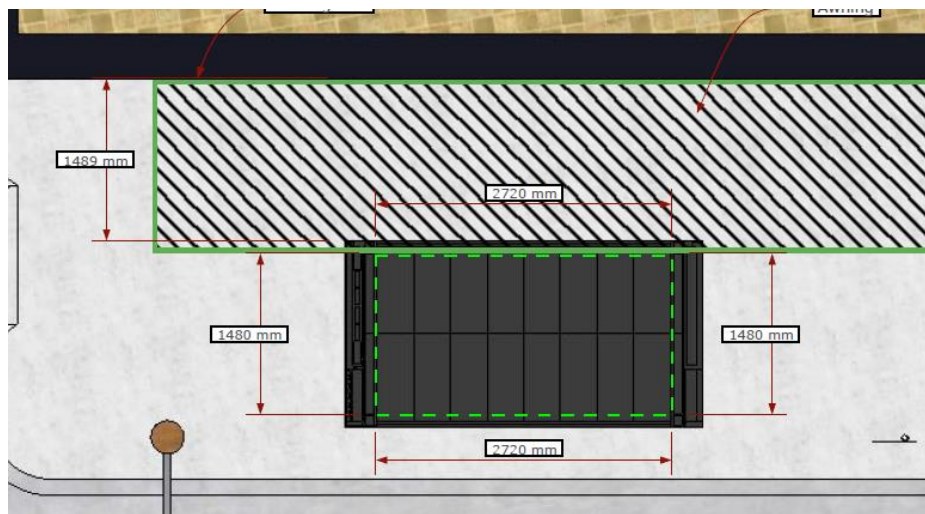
Proposed substation plan and dimensions (Source: Jolt)
